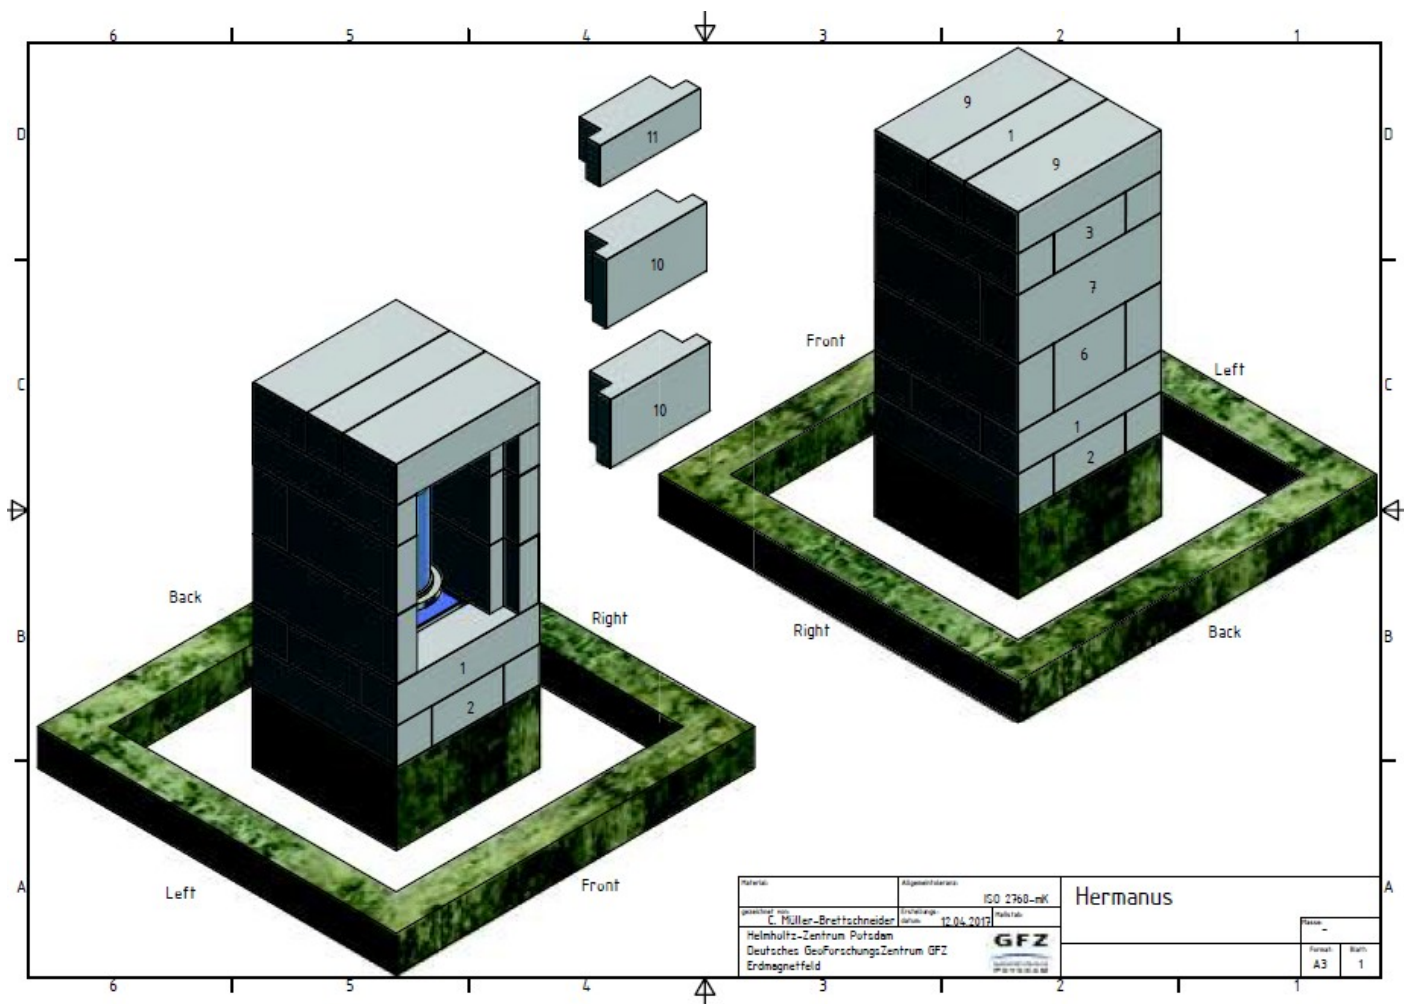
This diagram shows the design and construction of the enclosure made of aerated concrete blocks for thermal insulation of the sensor. The enclosure is built directly on to the concrete pillar.
